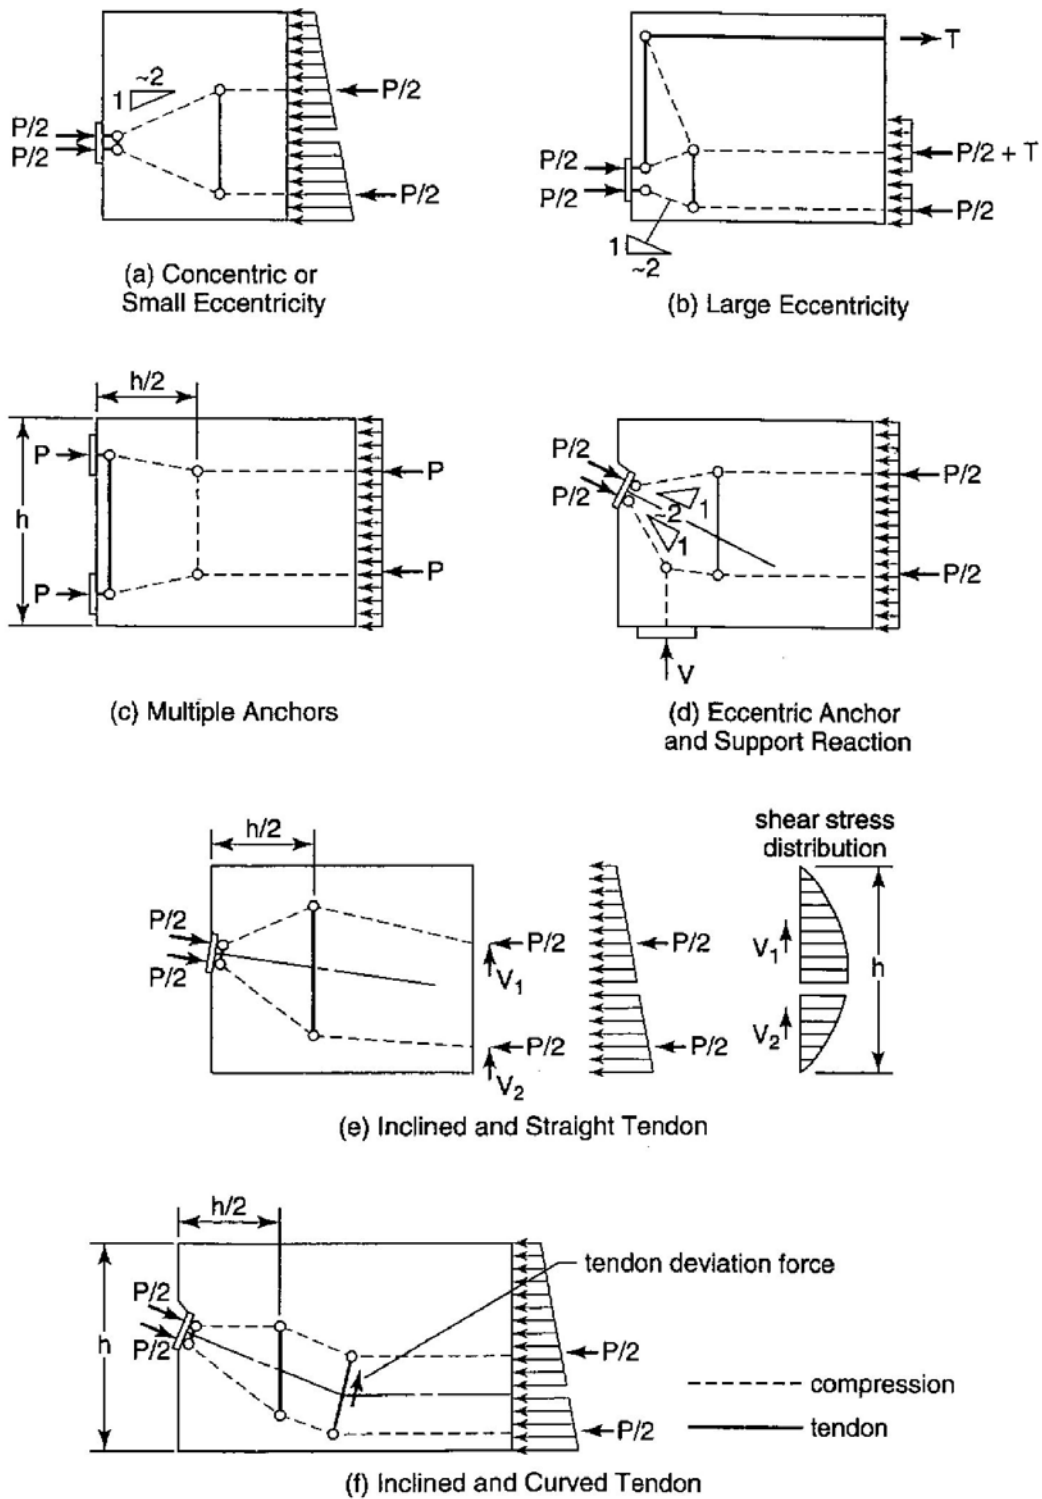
Typical Strut-and-Tie Models For End-Block Anchorage Zones.
